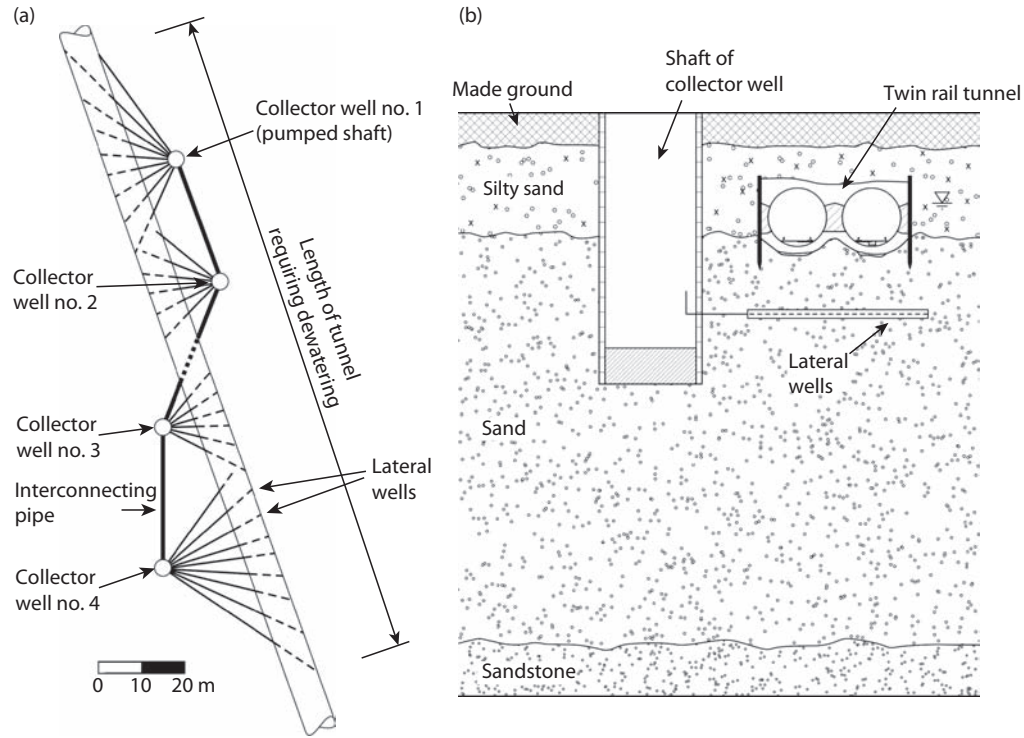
Collector wells installed around the tunnel. (a) Plan view. The tunnel length is dewatered by lateral wells drilled out from four collector well shafts. (b) Cross section. Lateral wells are drilled radially outward from the collector well shafts. (Courtesy of Strathclyde Partnership for Transport, Glasgow, U.K., and Keller Geotechnique, Wetherby, U.K.)
